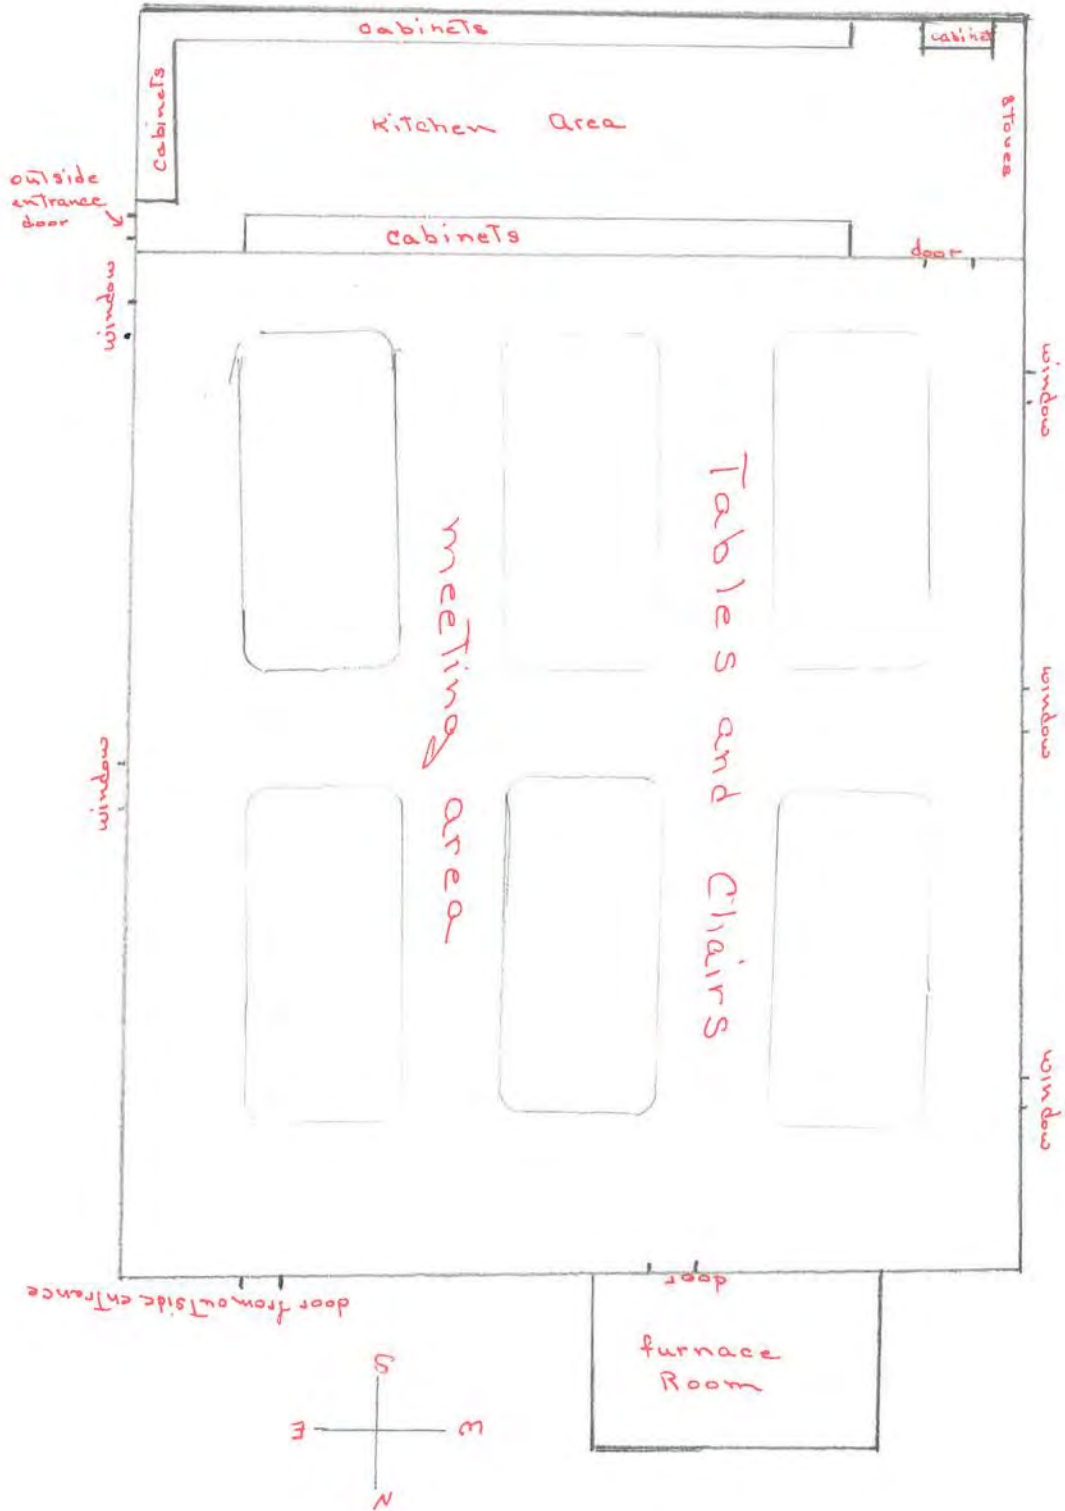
Interior basement floor plan (not drawn to scale). (Source: Greg Gilbertson, Waukon, Iowa, February, 2018)
